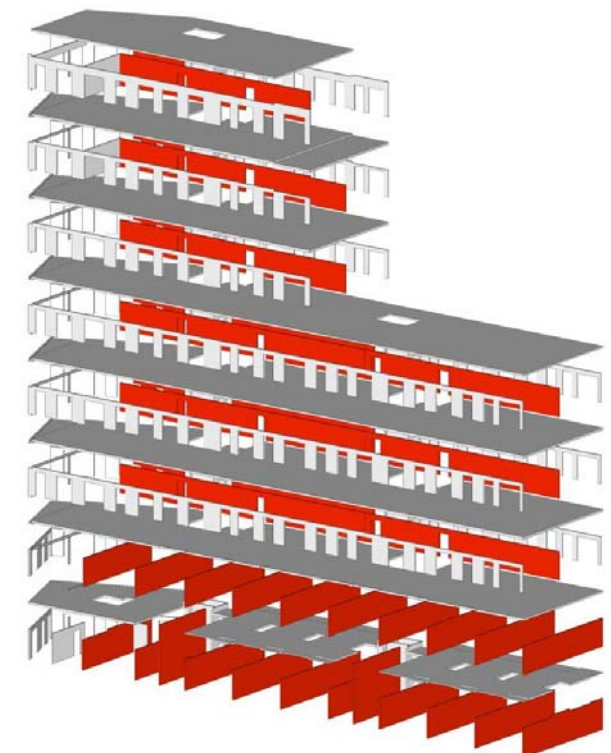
Structural Layout, Bridport House © EURBAN Ltd.
